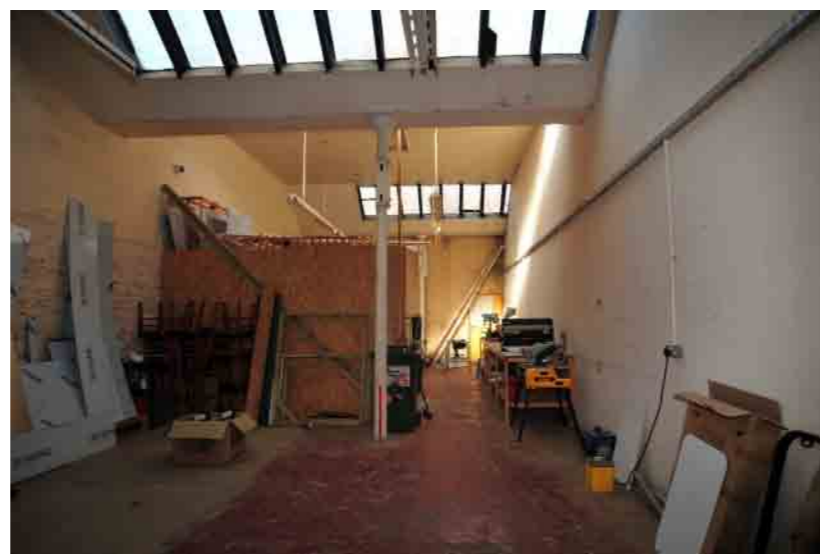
Building 3, Unit 33 cast-iron columns supporting the cast-iron support plate
